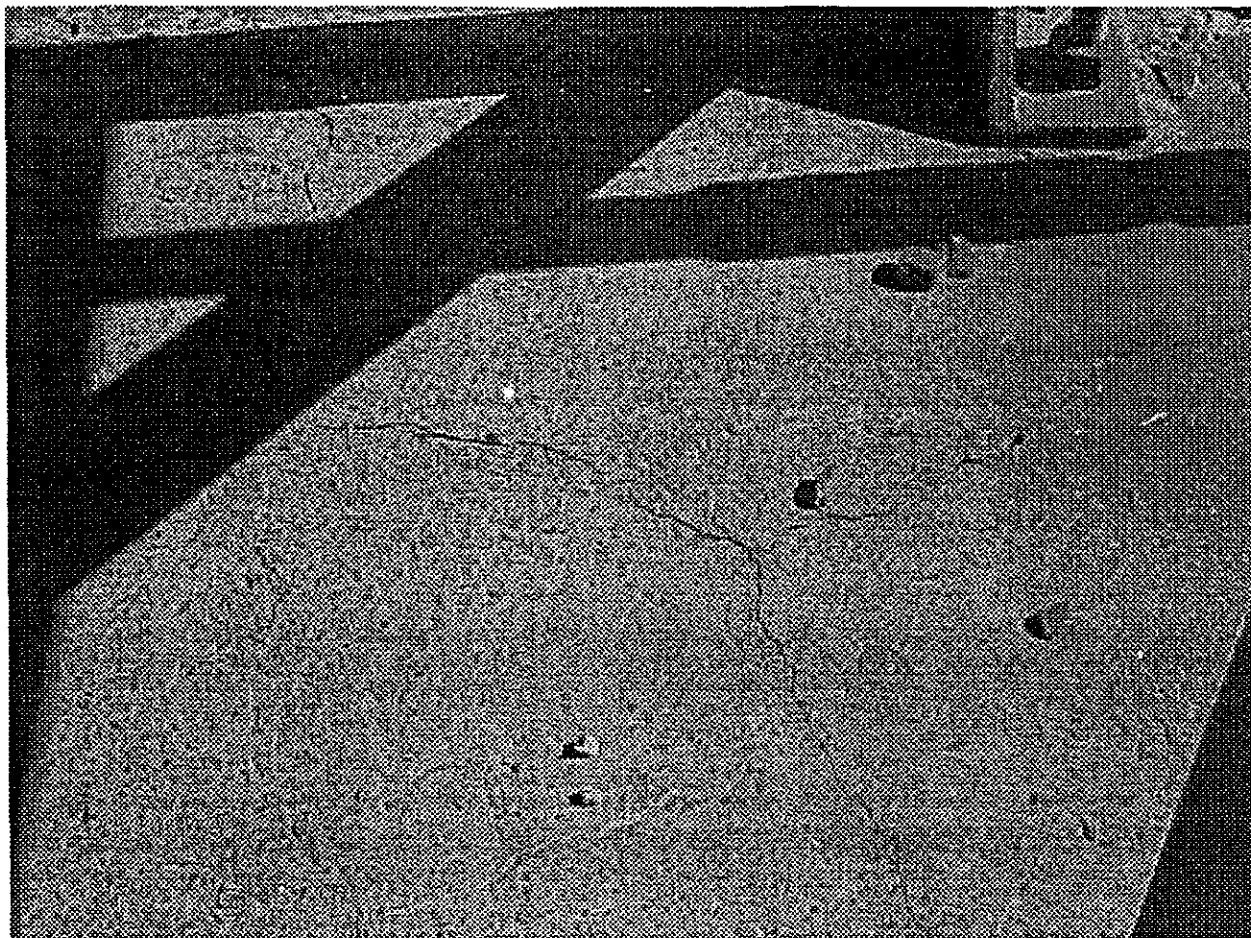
Typical cracking for Concrete Condition ‘C’.
